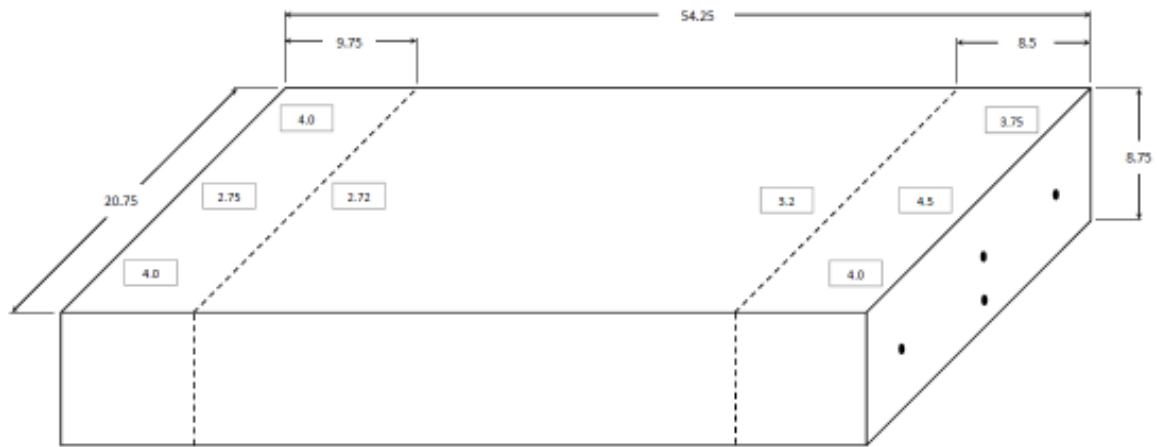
Crack, Damage Survey and Rebar Locations for Slab 4
